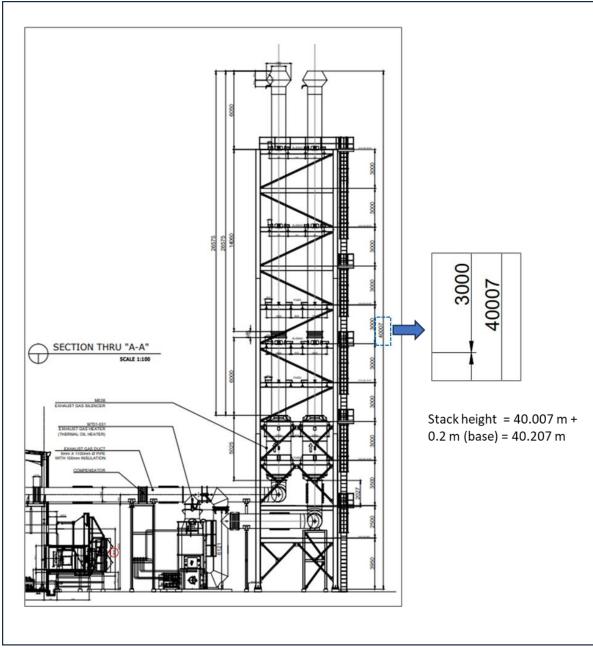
Elevation drawing of the stack of the existing powerplant
